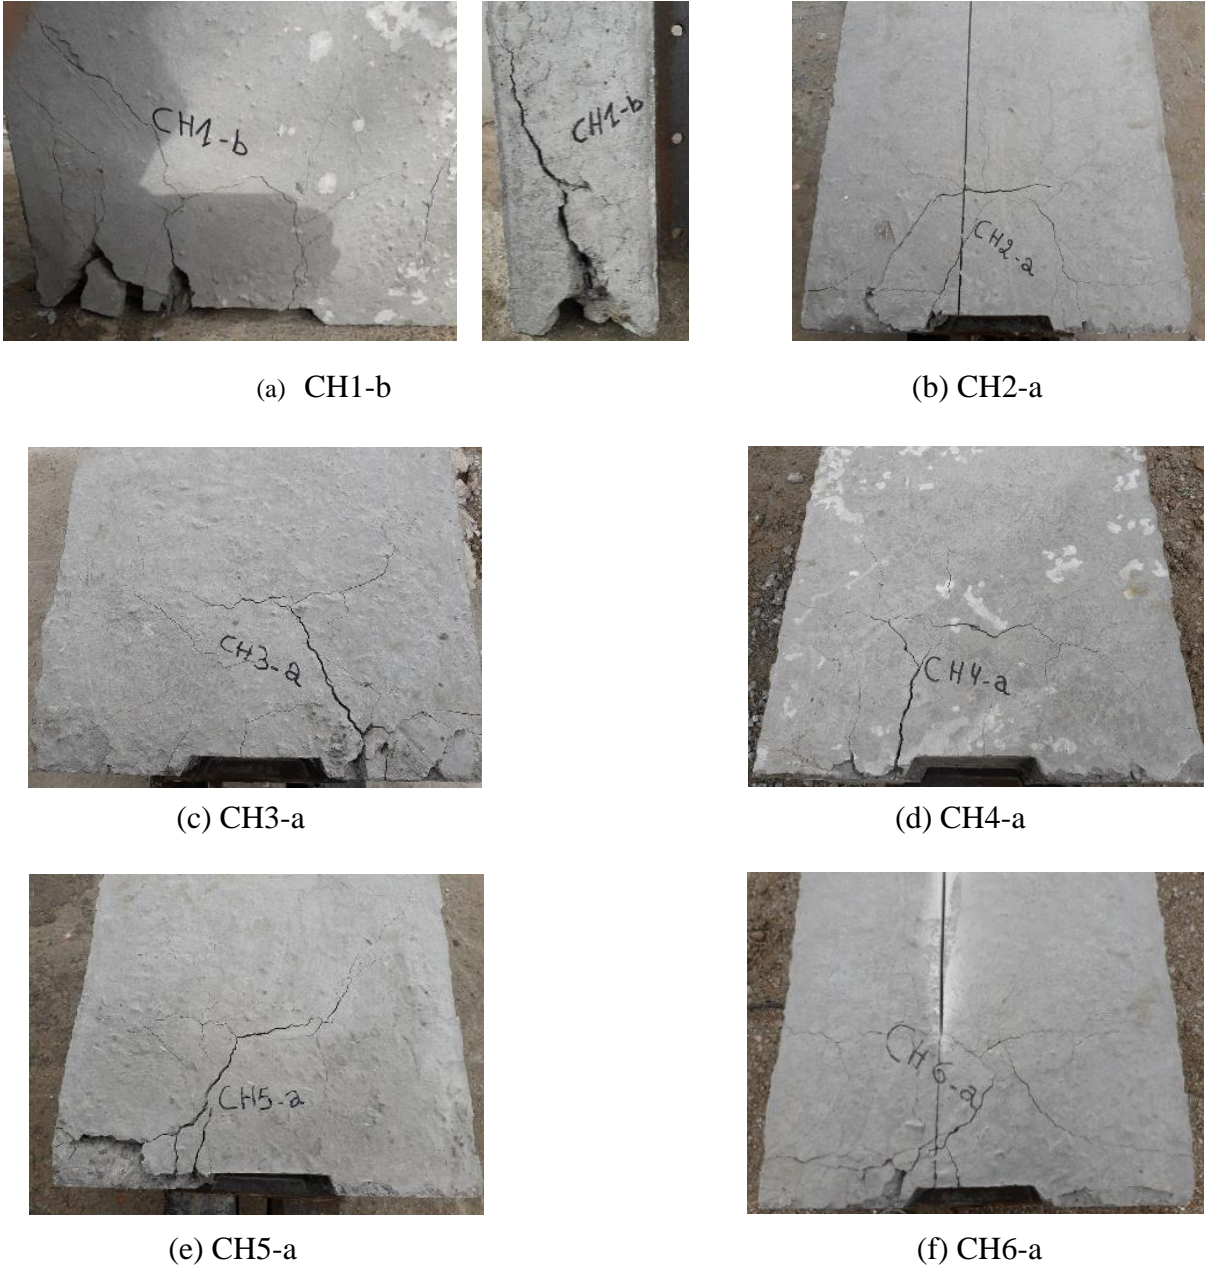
Typical failure modes: (a) concrete cracking-splitting; (b, c, d, e, and f) concrete cracking.
